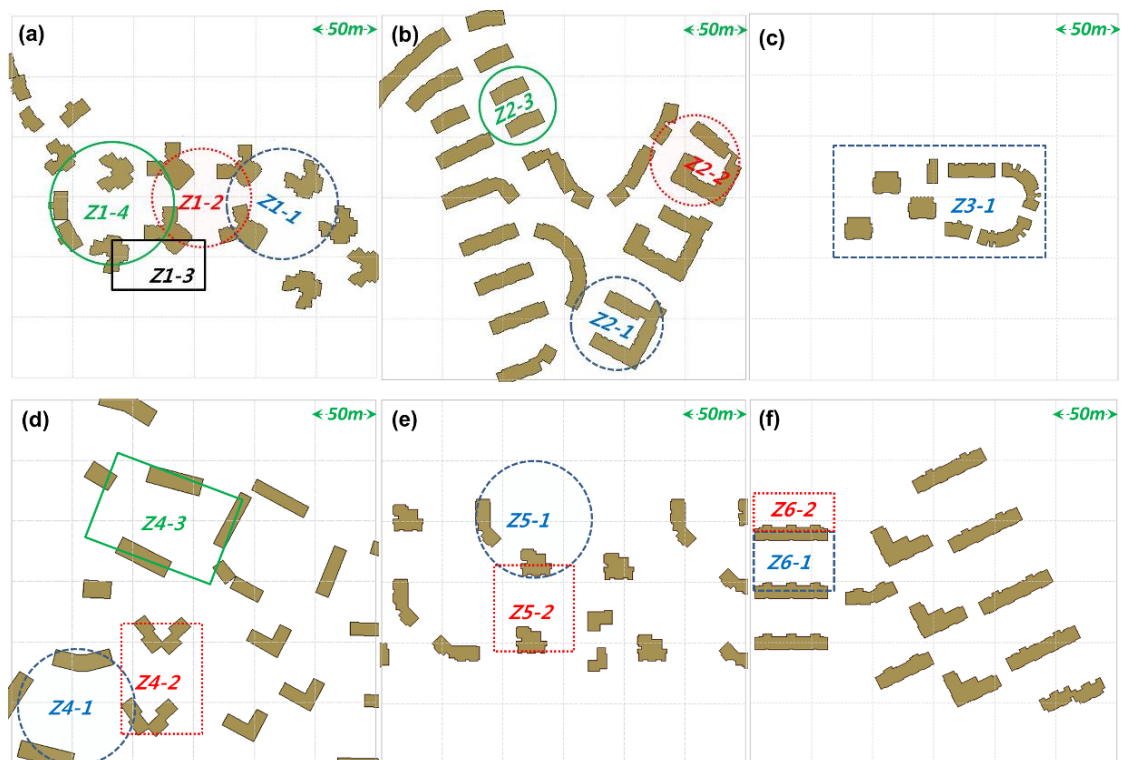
Ground plan and measurement zones for each apartment complex: (a) Site 1; (b) Site 2; (c) Site 3; (4) Site 4; (5) Site 5; (6) Site 6
